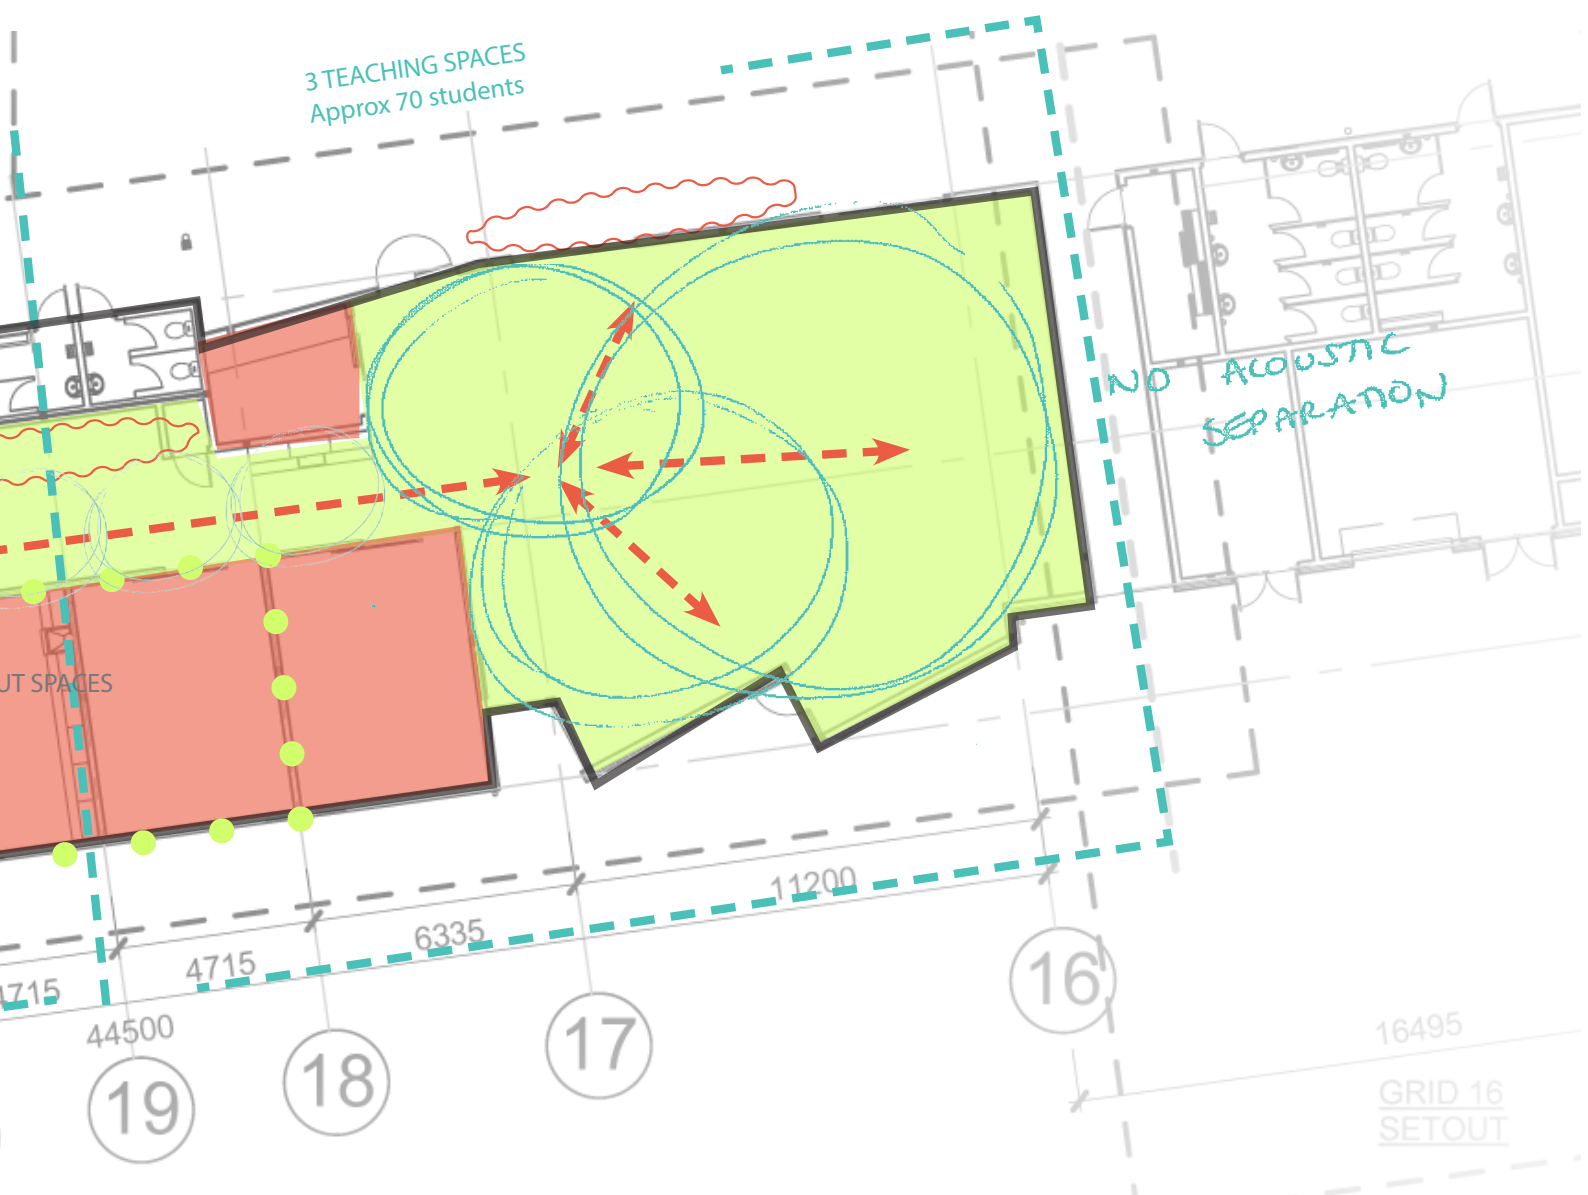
Pegasus Primary School: Analysed Floor plan
